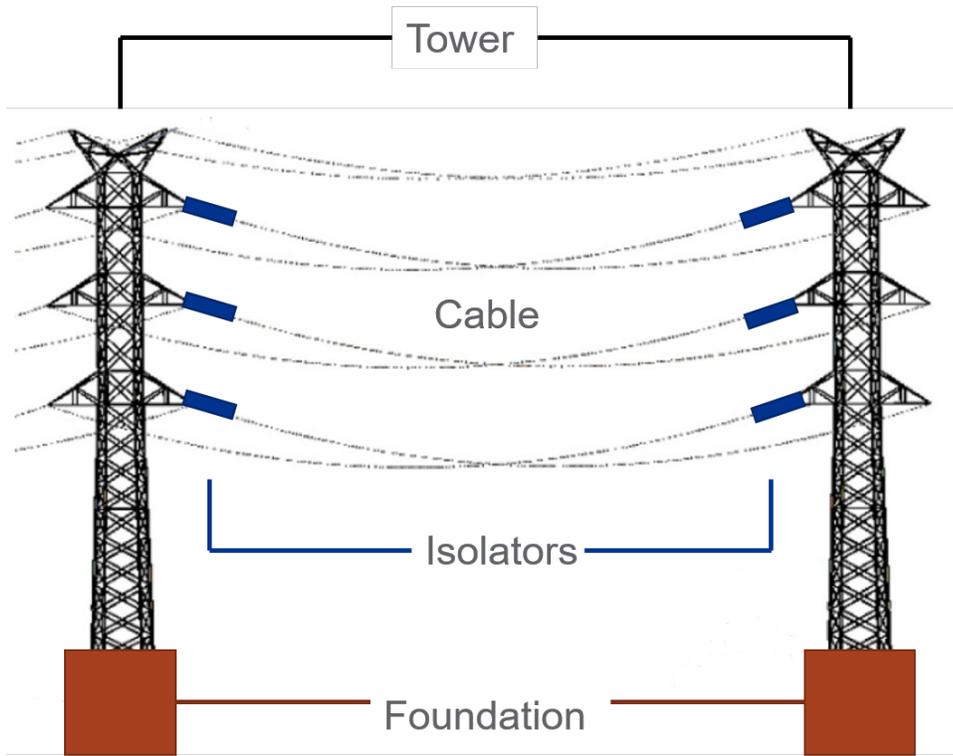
Mechanical loading transmission lines civil engineering designed. Failure containment. Image adapted from [12].
